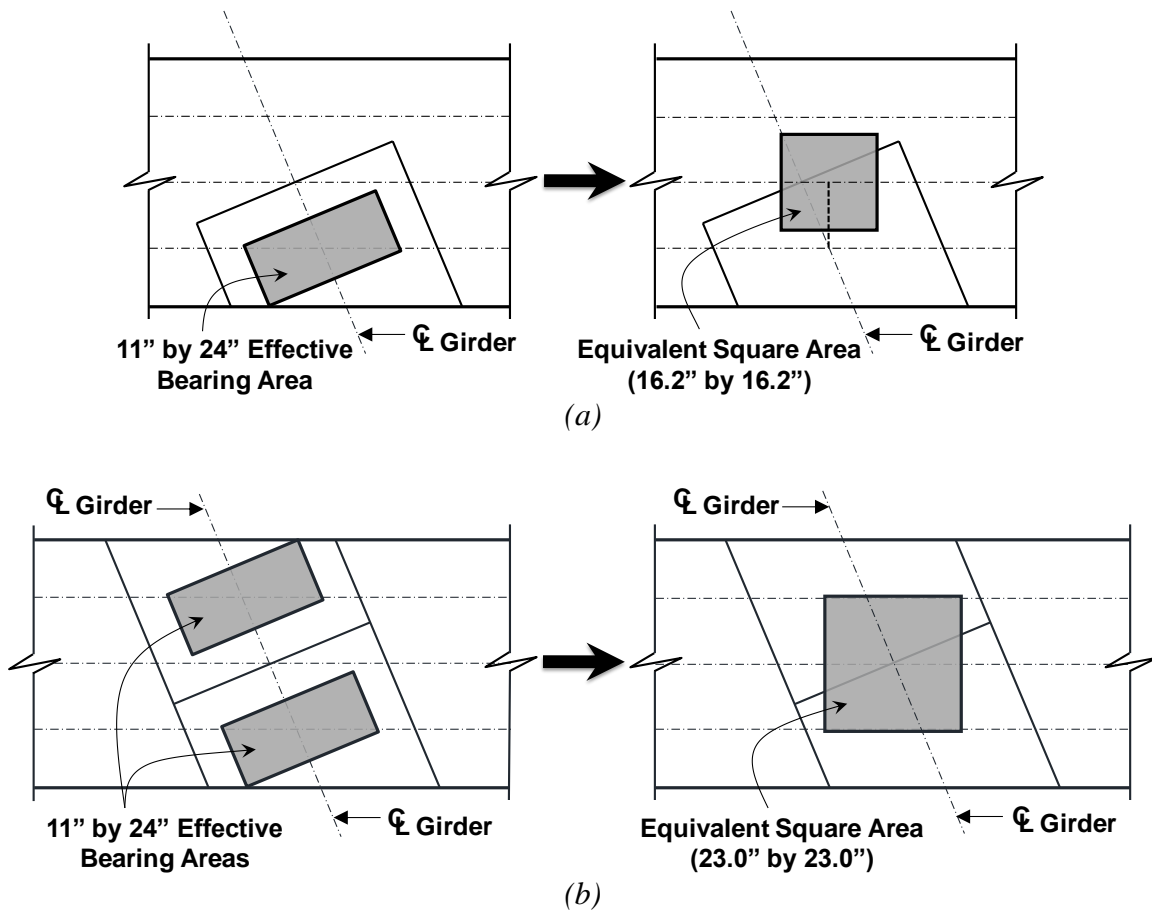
Assumed bearing areas for girder loads – (a) single girder load; (b) two girder loads that have been combined
